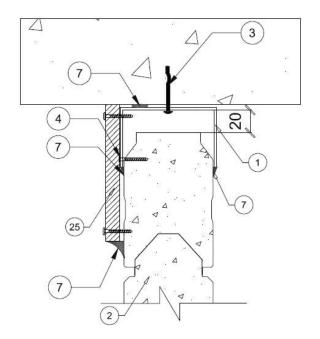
Head C-Track Detail with Flashing at Figure 44 – Head C-Track Detail with Plasterboard One Side Strip at One Side
